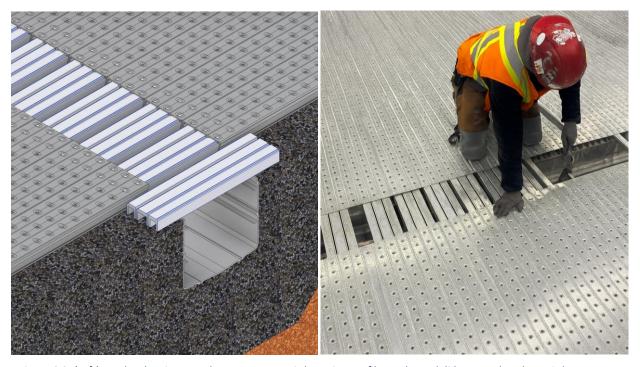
(Left) Render showing Trench cover support girders. First profiles and trench lid removed to show girder supports. (Right) Trench support girders installed in the field
